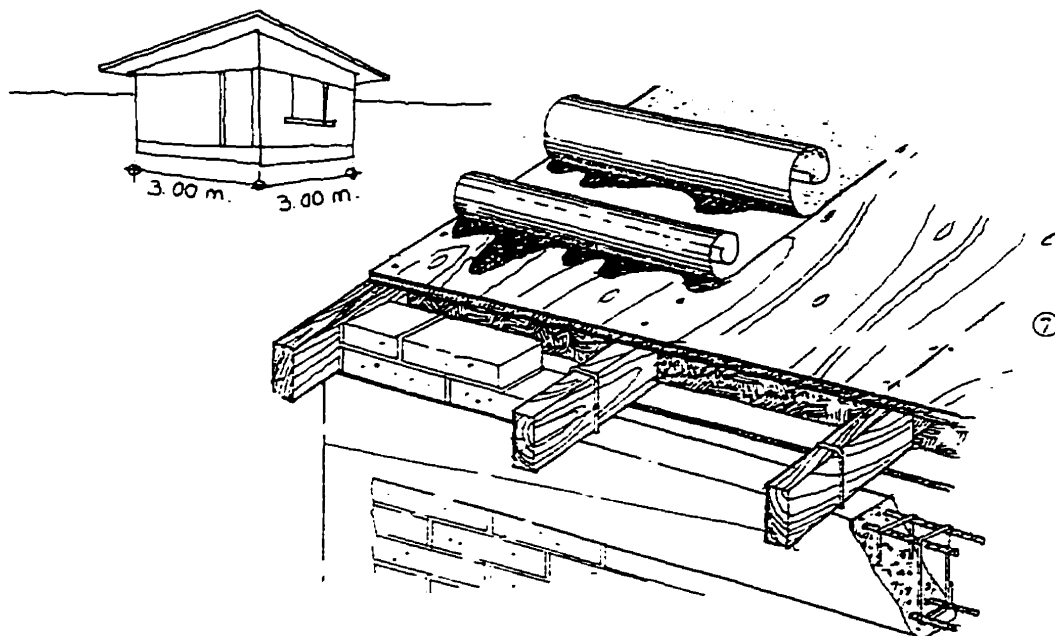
Traditional roof structure (Yruegas, 1978)
